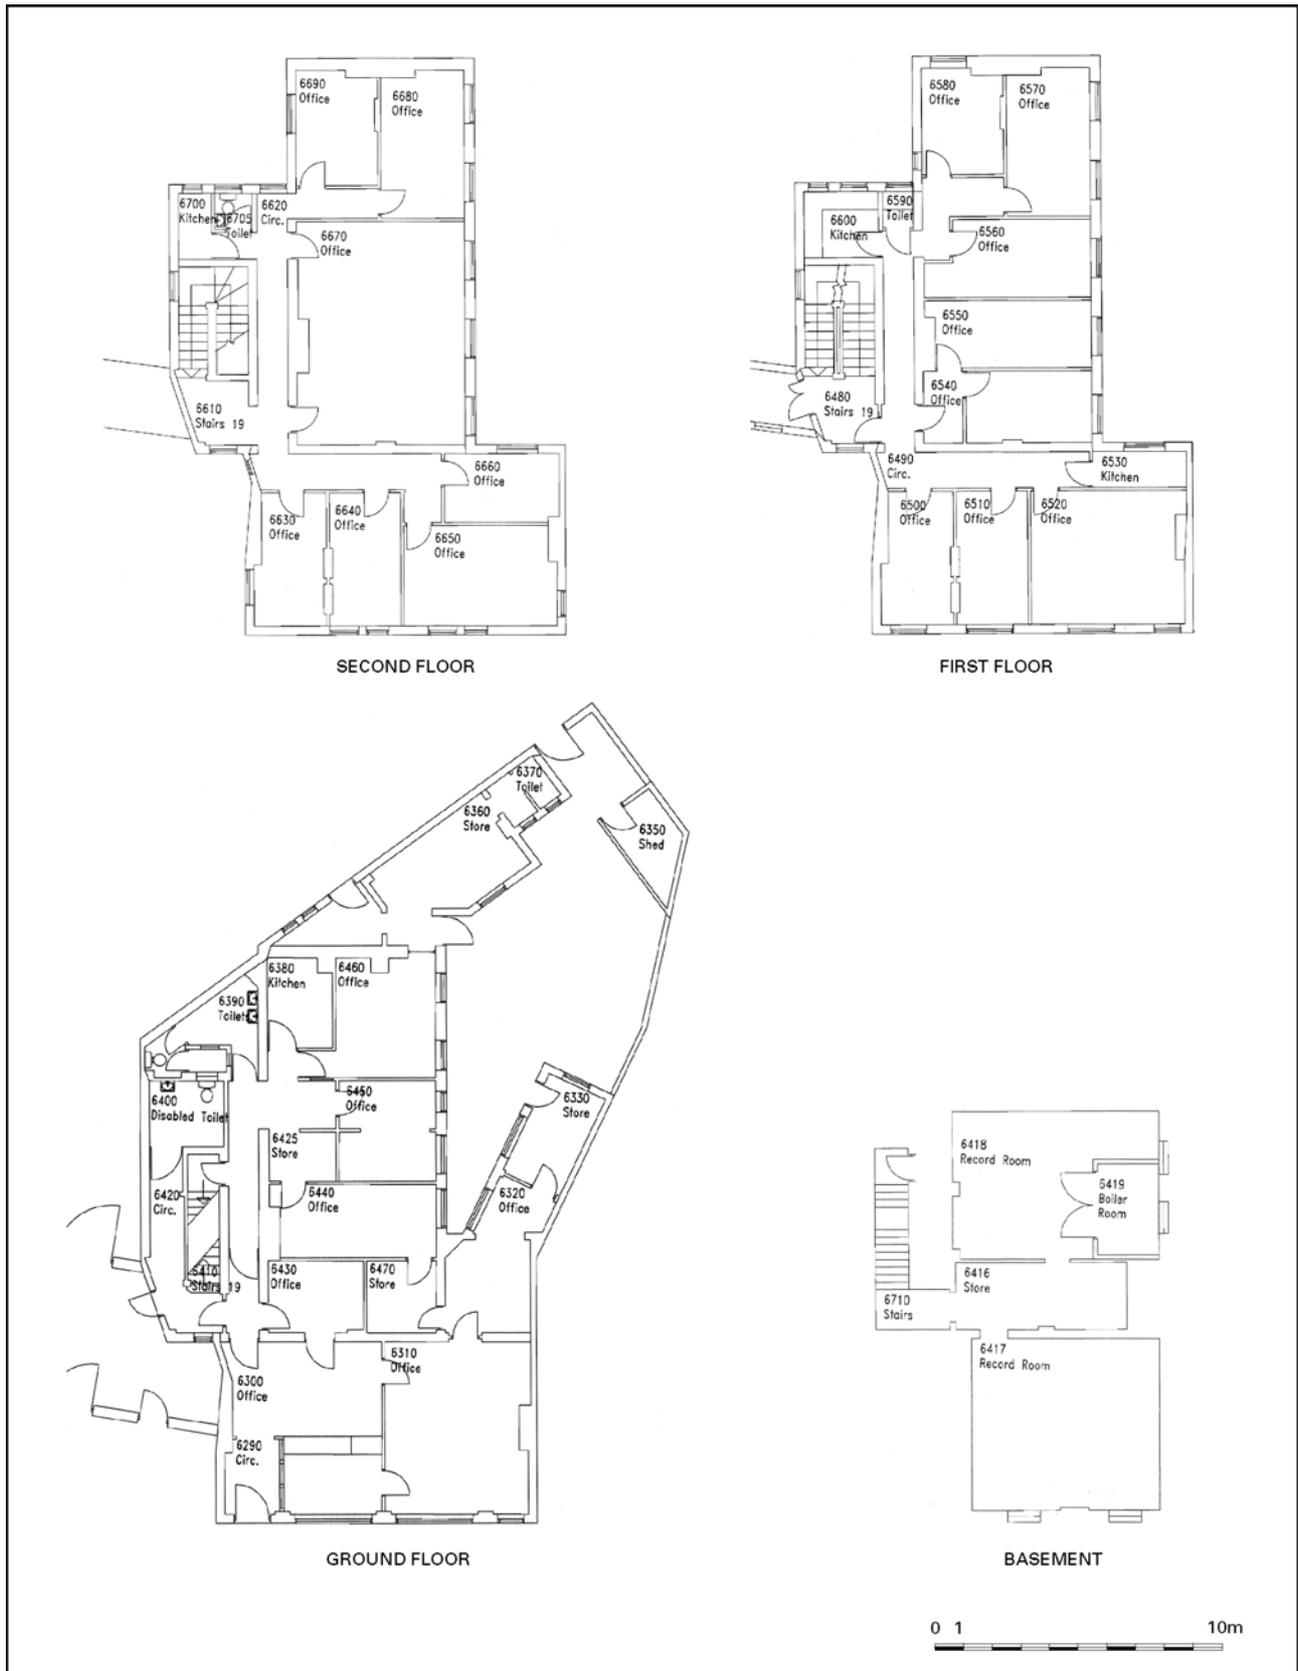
16 Old Square (former Coffee Tavern), floor plans
